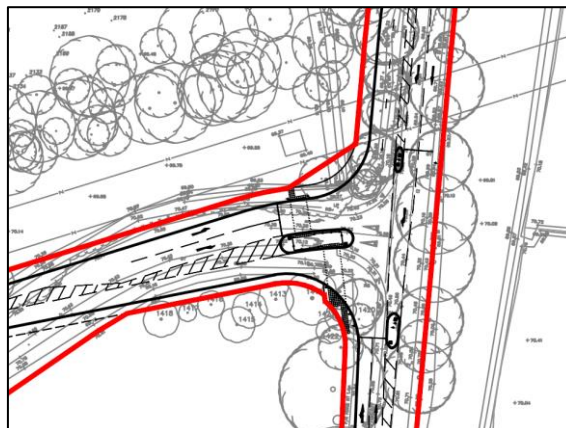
Planning Stage Plan for Balcombe Road Signal Junction
